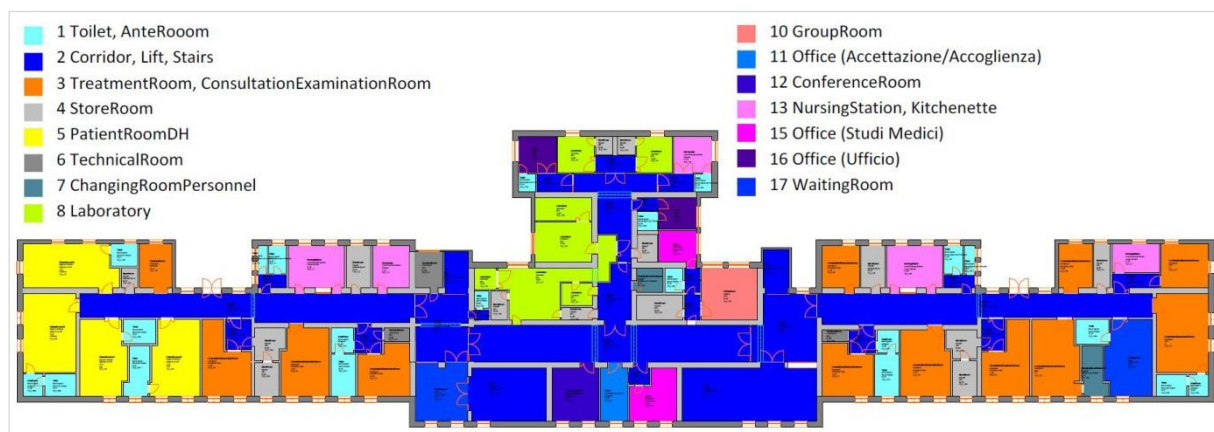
The new layout of the first floor of San Luca Vecchio building
